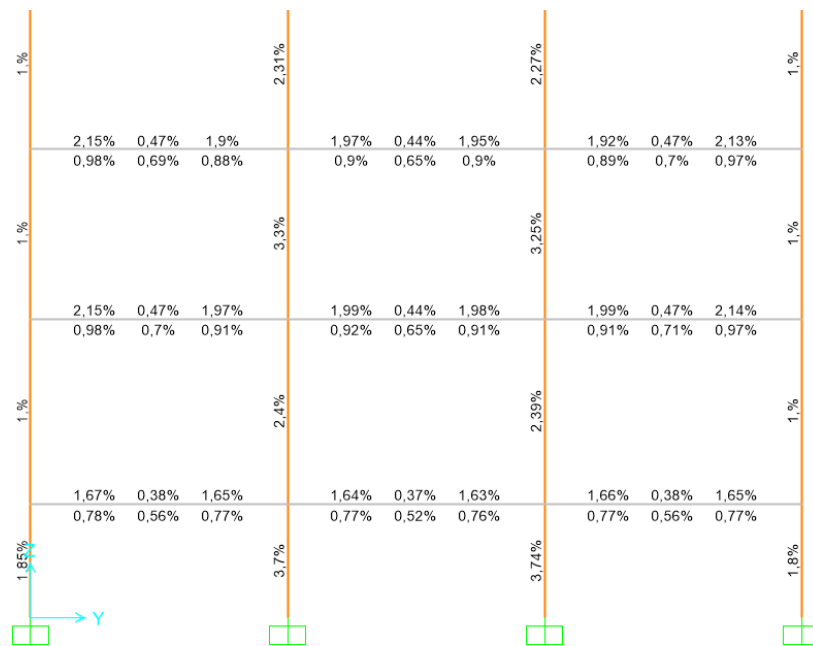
Example of reinforcement percentage columns and beams for short frame
